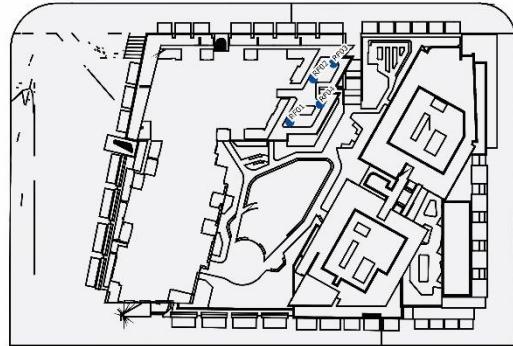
Layout of Pressure Sensors – Level 4 Plan
